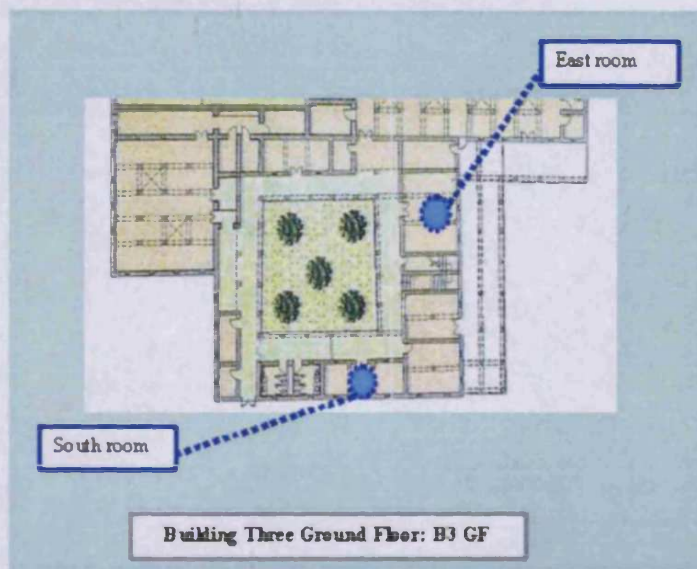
Tested rooms in the ground floor of B3 GF.
